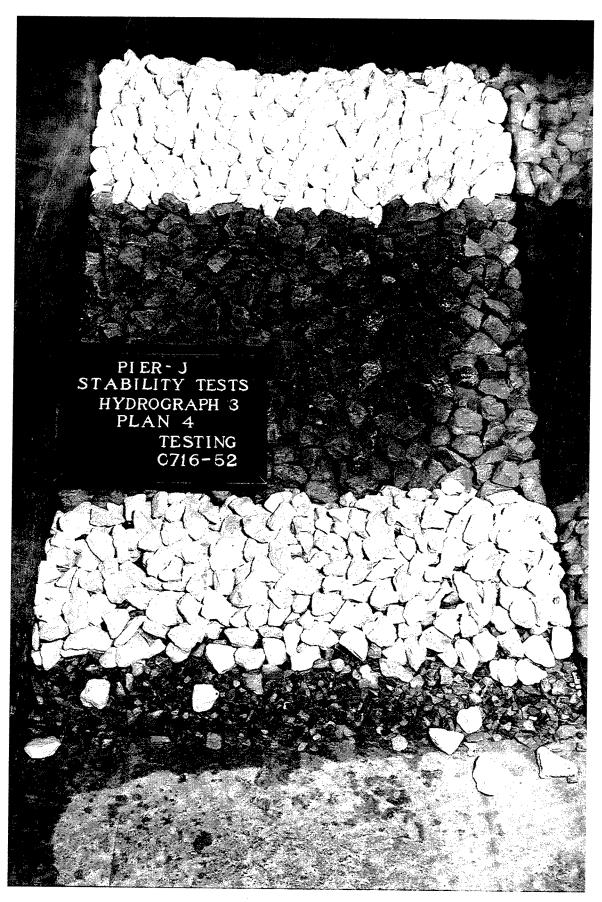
Sea-side view of Plan 4 after testing step 15 of Hydrograph 3
